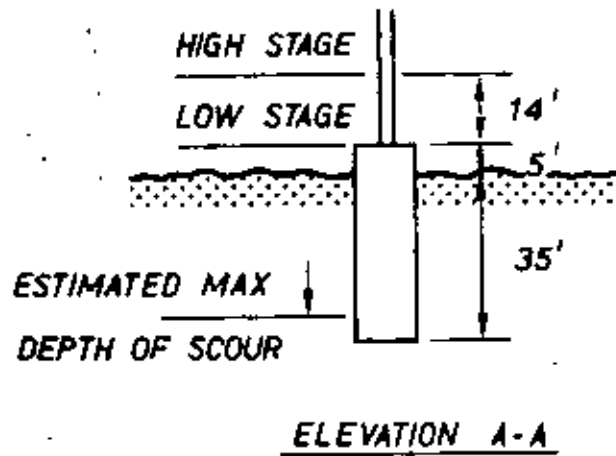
SKETCHES ILLUSTRATING SCOUR FAILURE OF BRIDGE C (NEILL 1964)
